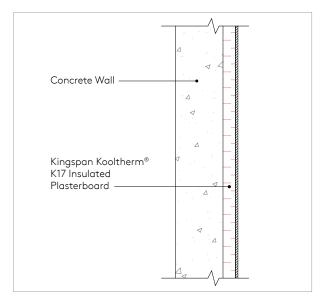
Side elevation - Concrete wall with Kingspan Kooltherm® K17 Insulated Plasterboard.
